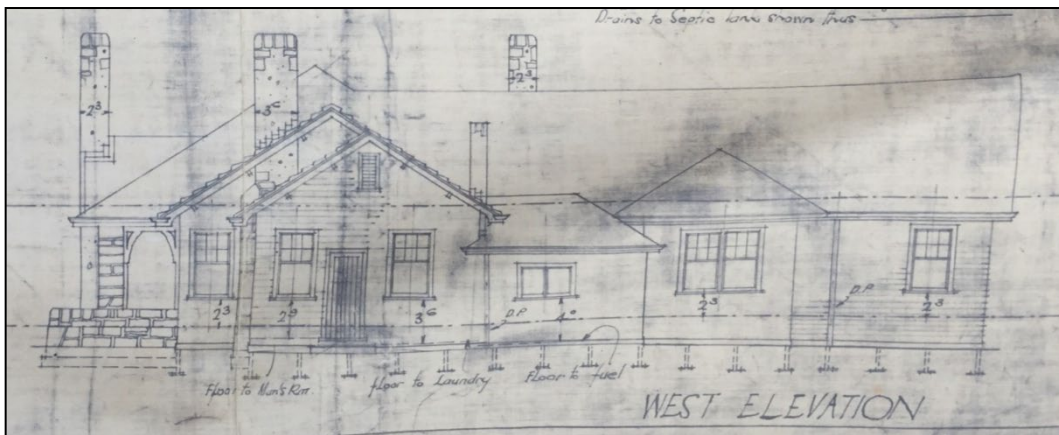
West elevation. Drawing by architects Oakley & Parkes, dated December 1930 (2018 owner's collection).
